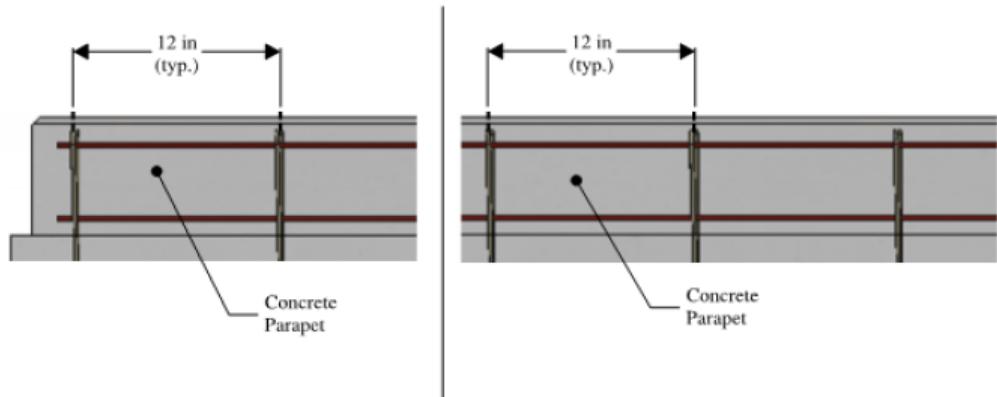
Elevation View of Bridge Rail System at Ends/Joints
